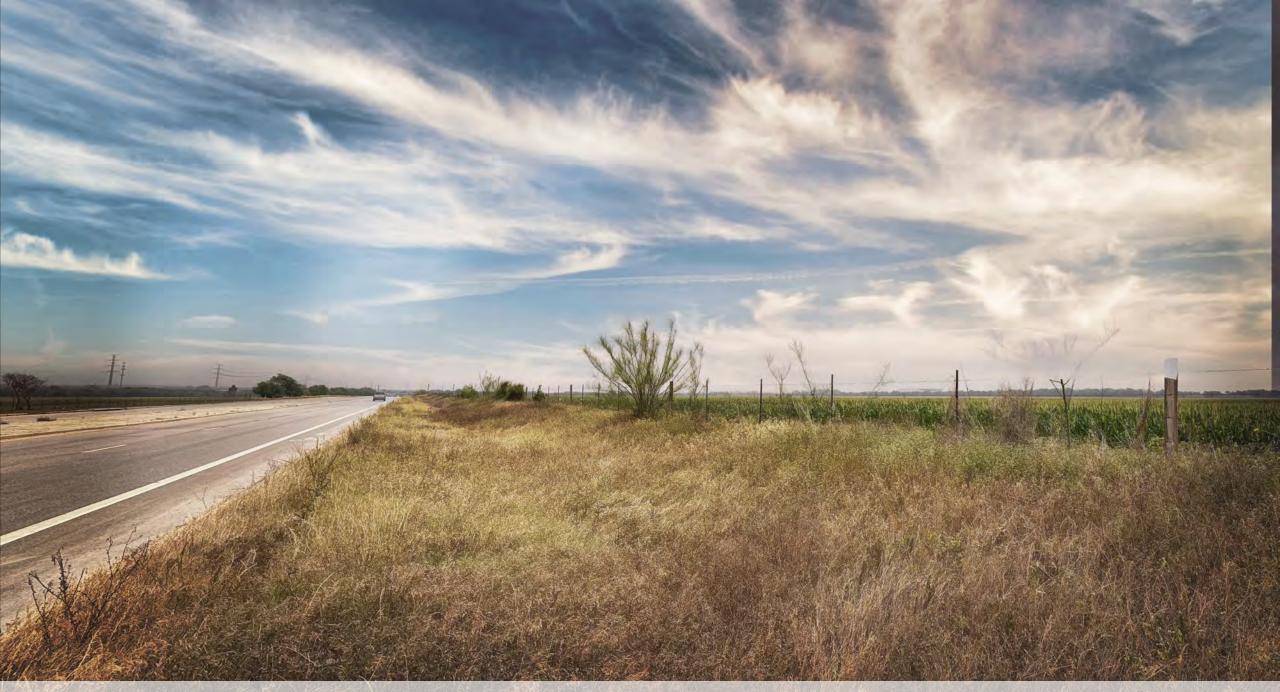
Transformative Project: Nacogdoches Road – Existing Streetscape
